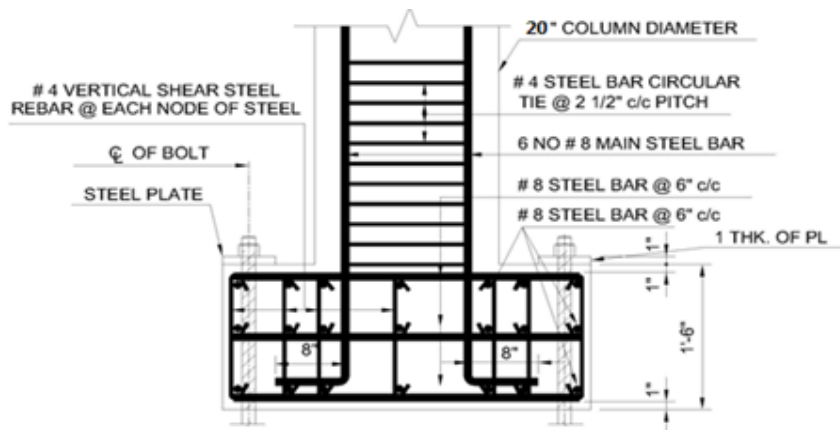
Reinforcement detailing of pier specimen with foundation detailing.
